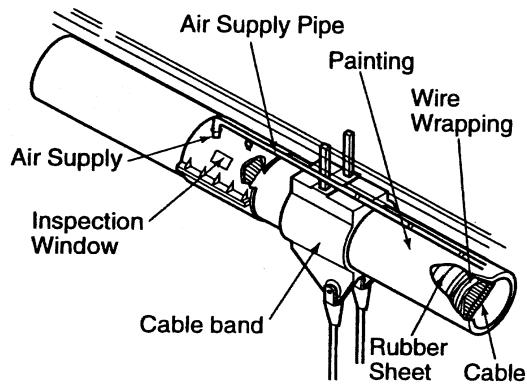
Dehumidified air-injection system for the main cables of the Akashi Kaikyo Bridge. (Courtesy of Honshu-Shikoku Bridge Authority.)
